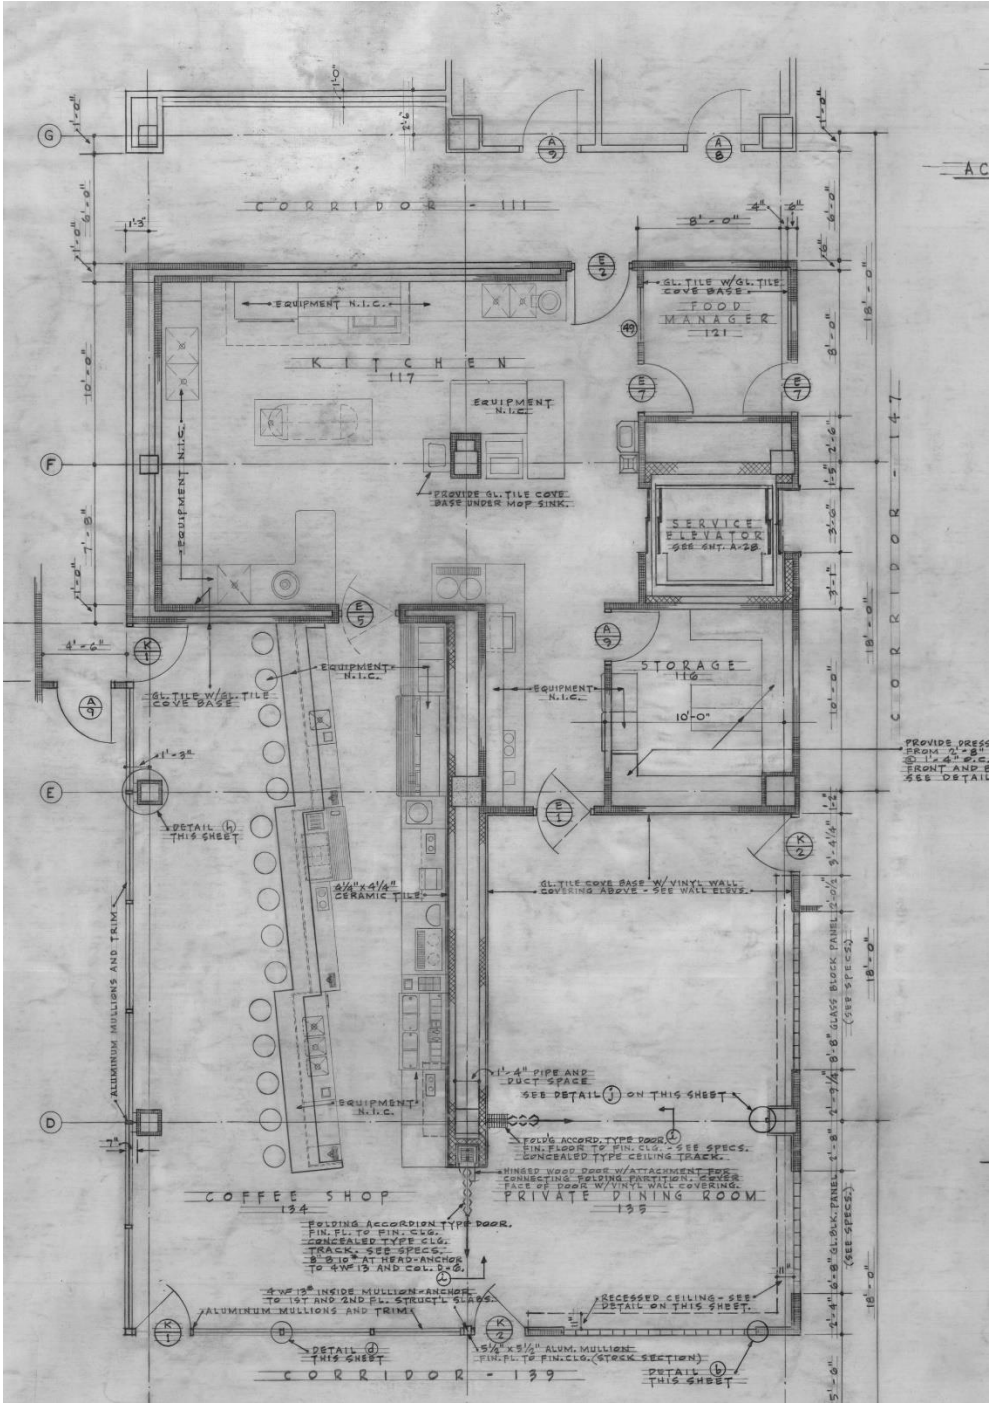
Detail of Coffee shop (Room 134), Kitchen (Room 117) and Dining Room (Room 135) (Turley 1958; Sheet No. A-39).
